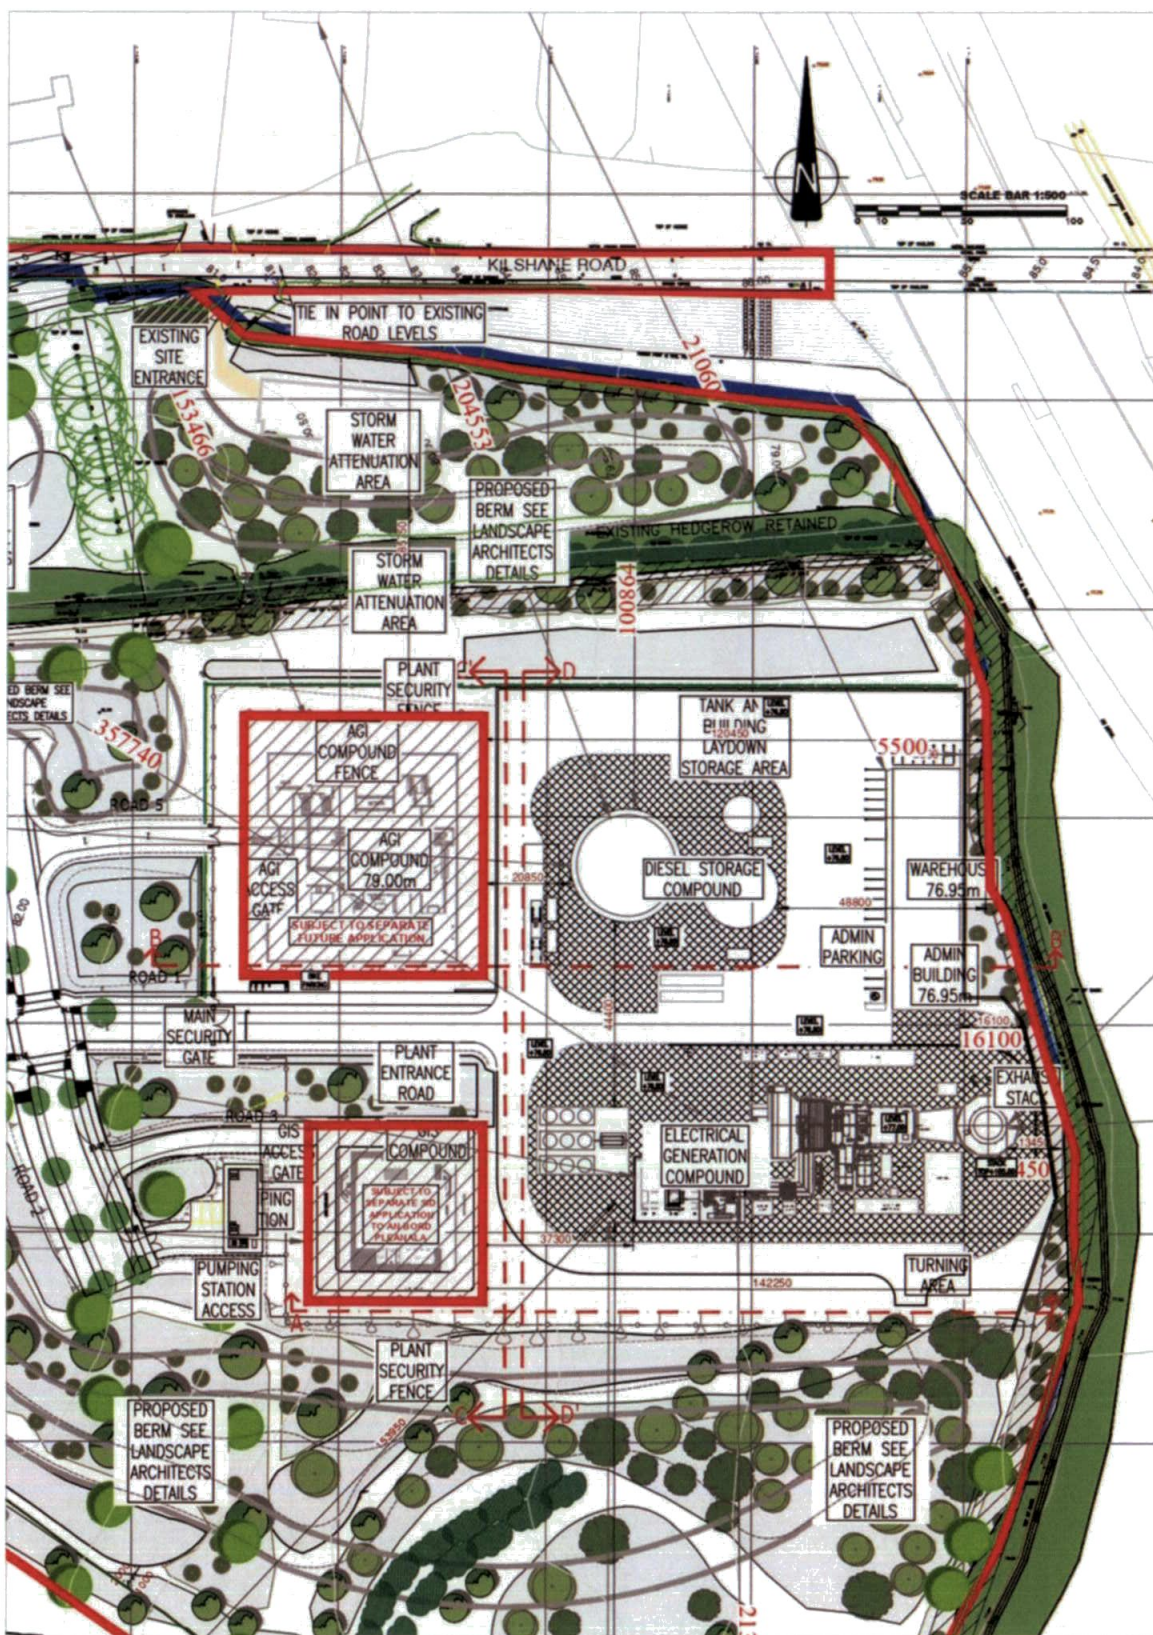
Proposed Site Plan Part 2 (Northeast)⁴
